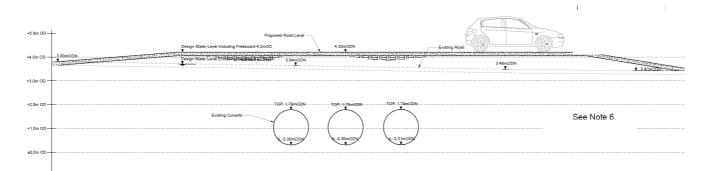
Indicative Cross Section of the Raised Road at Church Street
